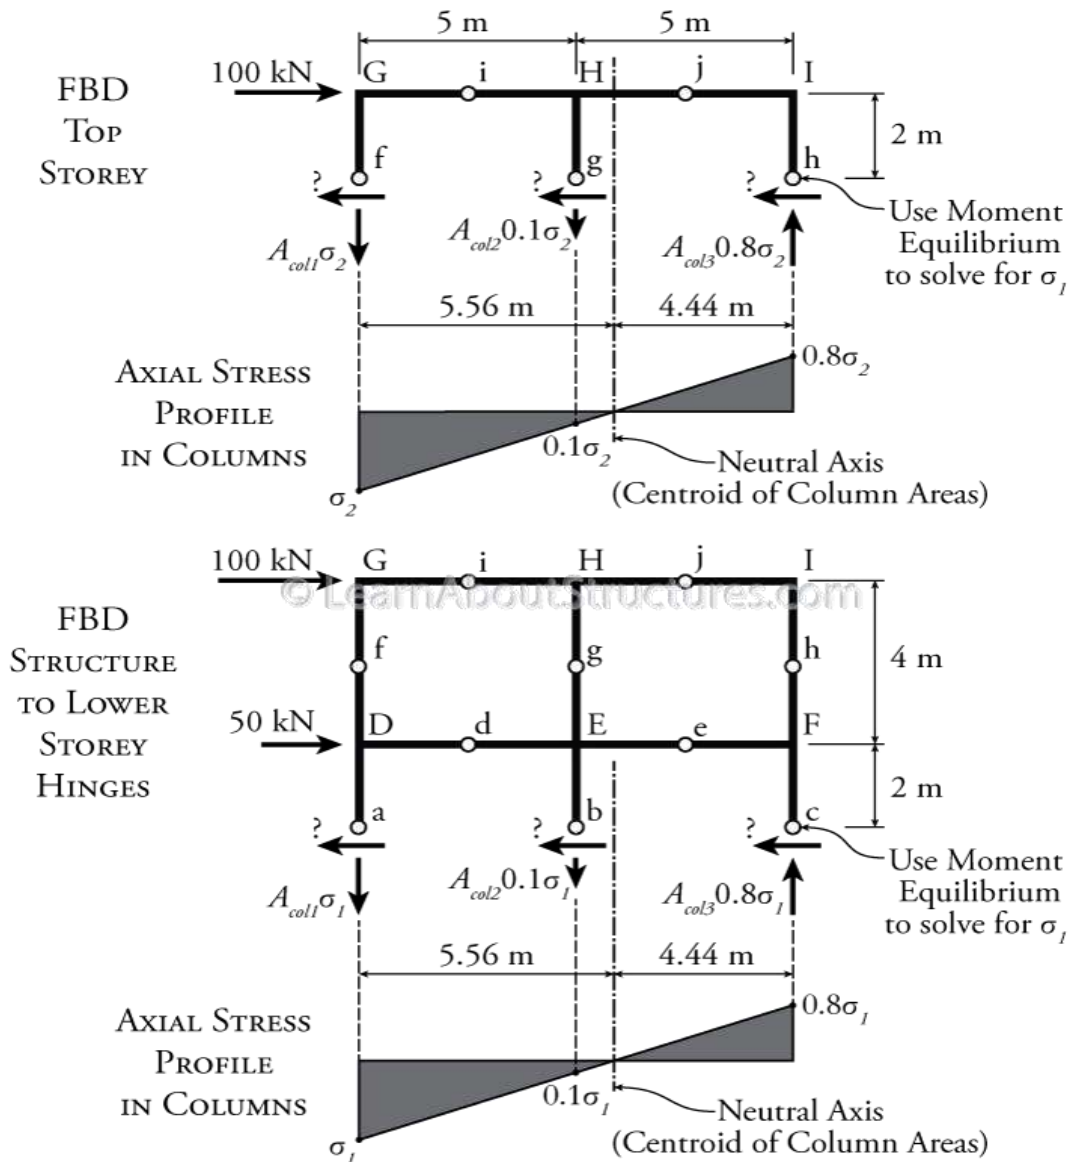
Cantilever Method Example - Determining Column Axial Forces
